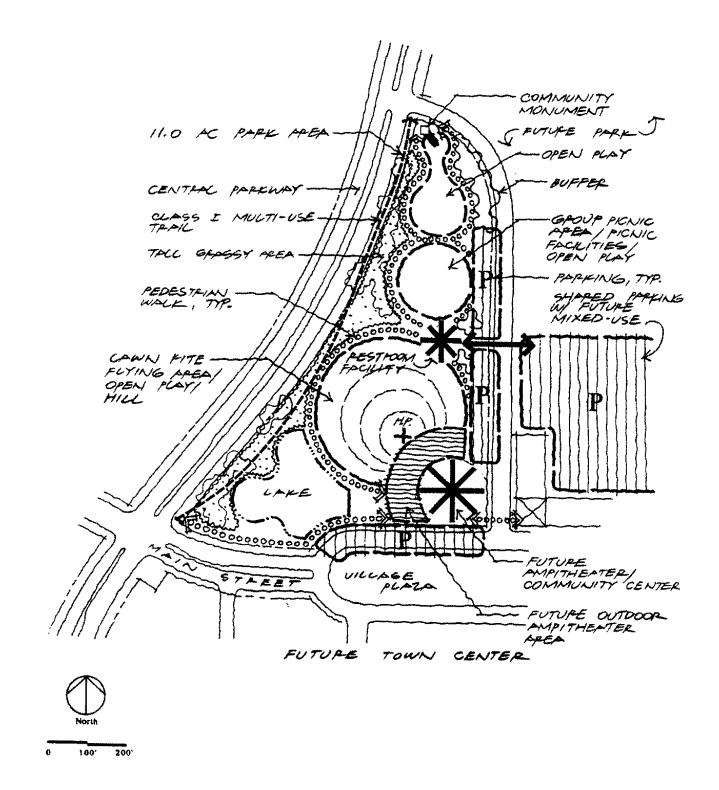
(A) – MOUNTAIN HOUSE CREEK PARK PLAN
